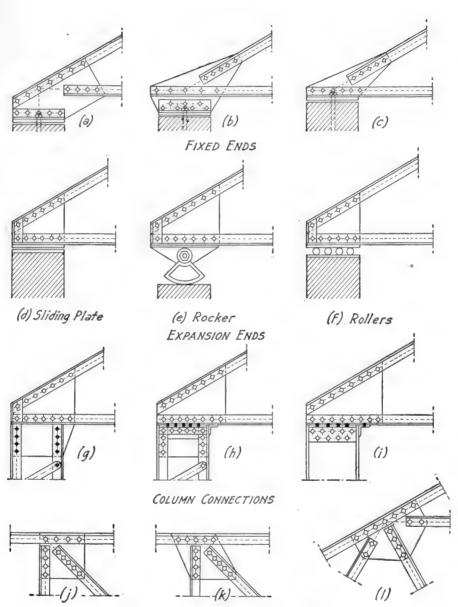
DETAILS OF A RIVETED STEEL TRUSS.
